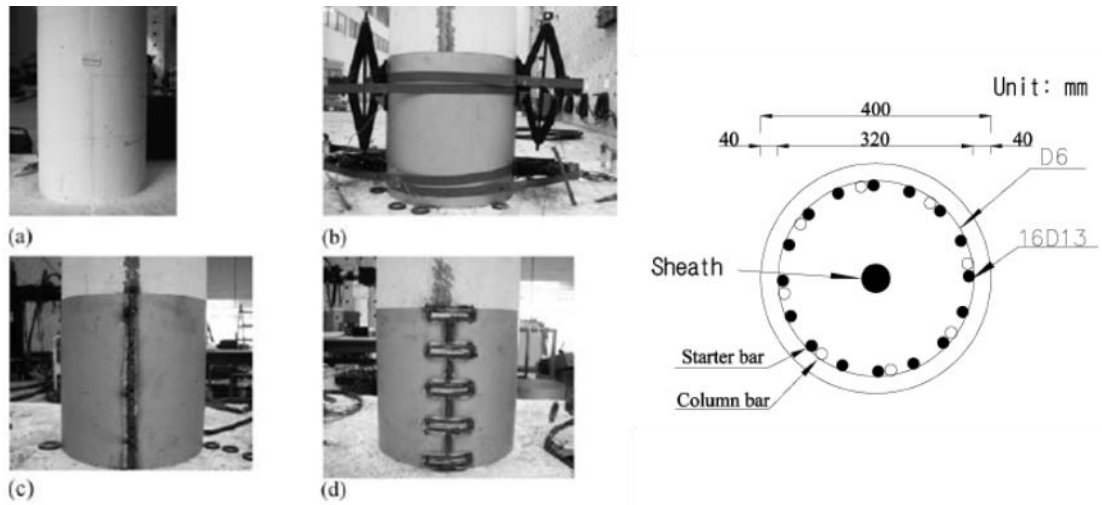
Jacketing procedures and cross section of the column (a) As build column (b) Apply external pressure on steel jacket (c) Weld overlap line and (d) Weld lateral strip bands , (Choi et al., 2010)
